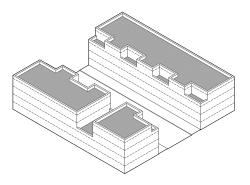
BUILDING ARTICULATION AT UPPER FLOORS ONLY
